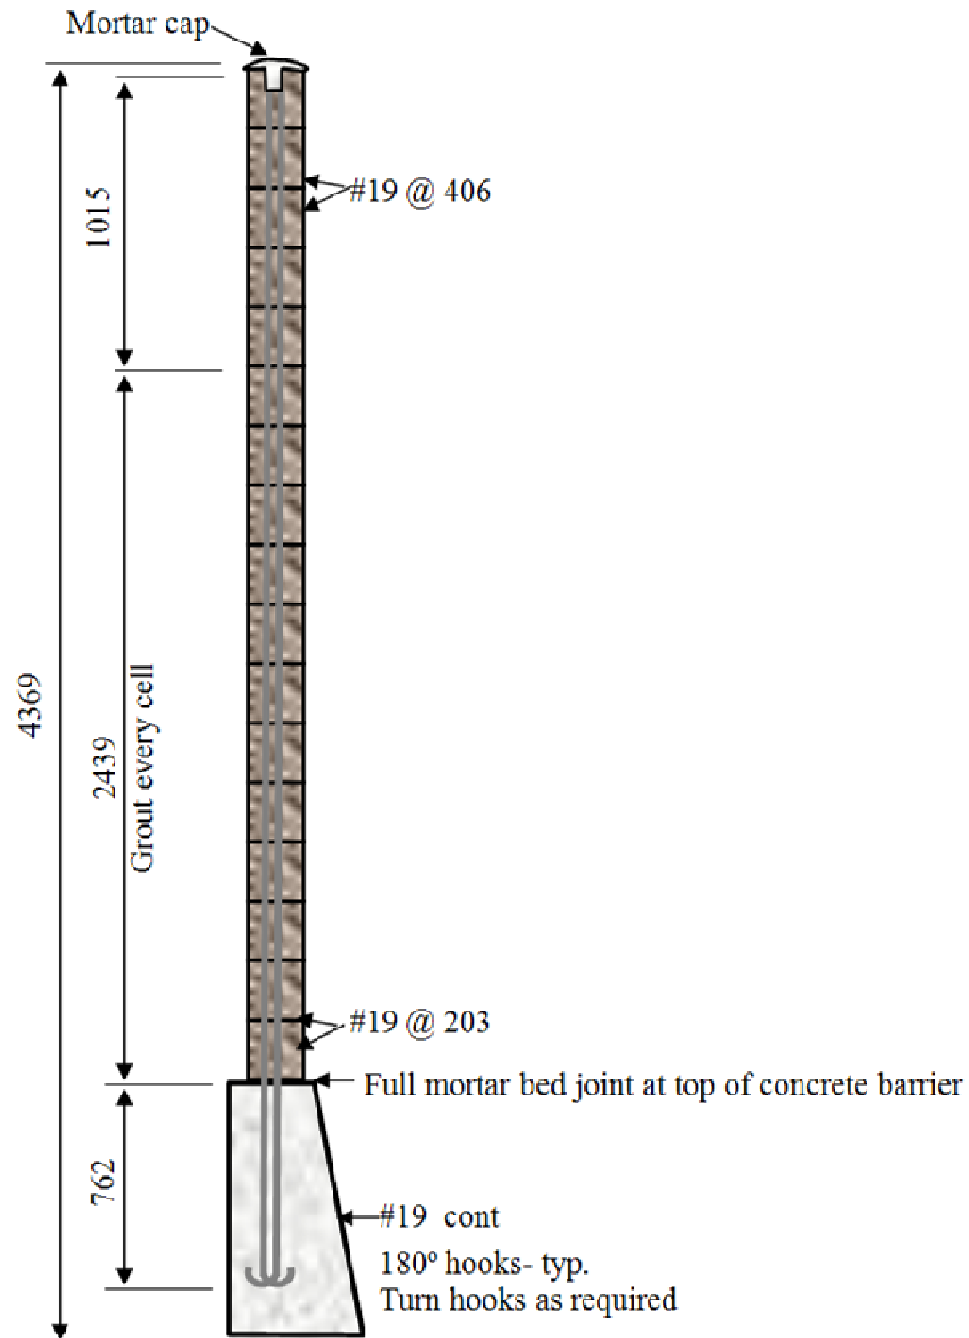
Standard CALTRANS masonry sound wall design [159]
